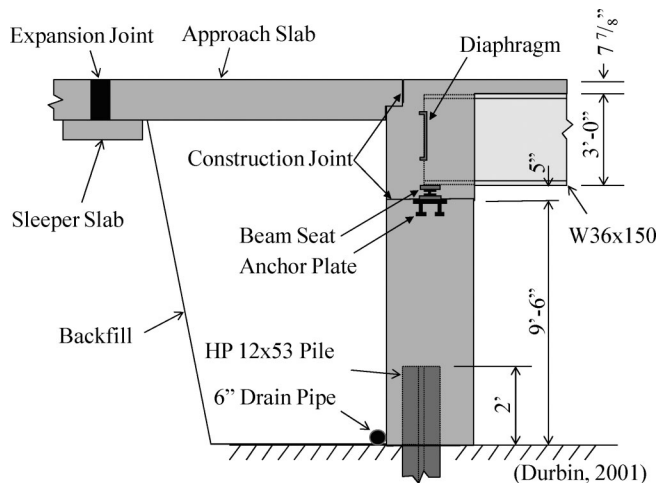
Typical Cross-section of I-65 over SR-25 Abutment
